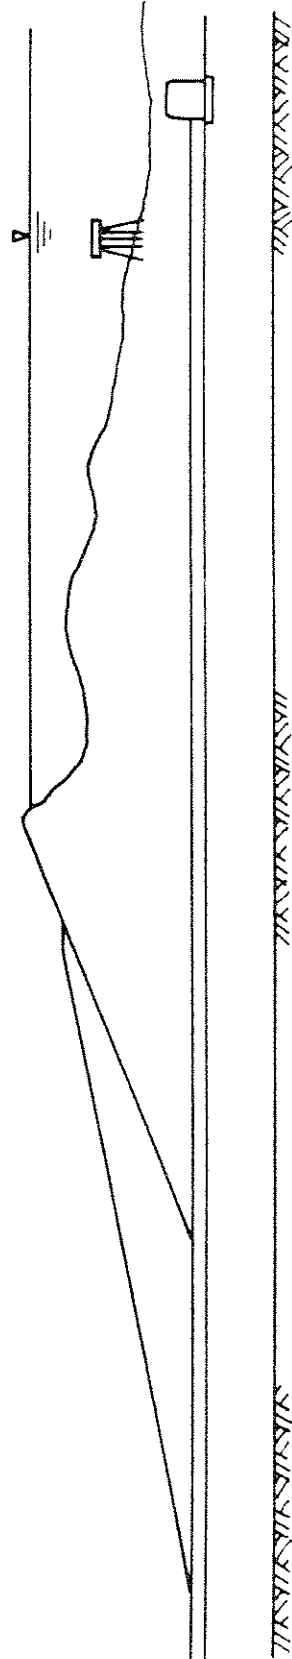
SLIDE DAMAGE NEAR WEST ABUTMENT -
